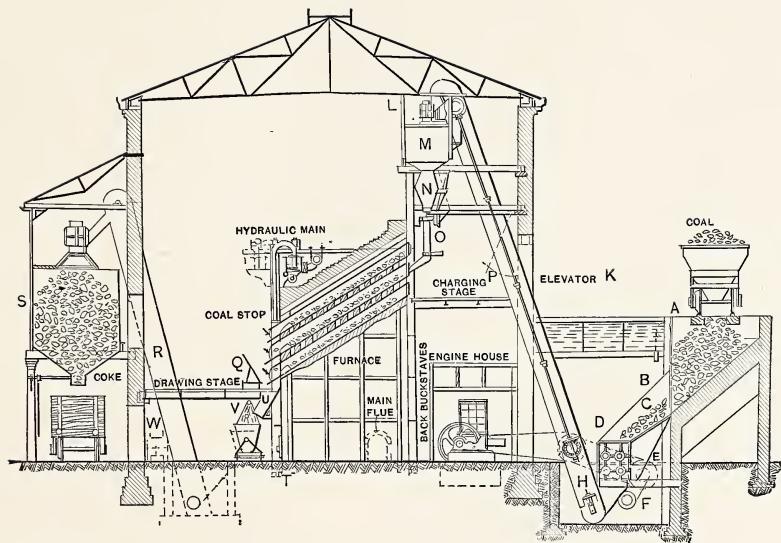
SECTION OF COAL GAS PLANT USING INCLINED RETORTS.
